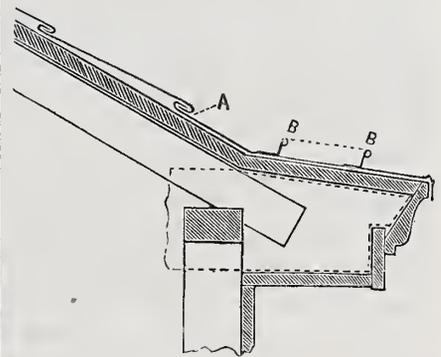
Plan of Making a Double Gutter in Connection with a Sheet Iron Roof.
